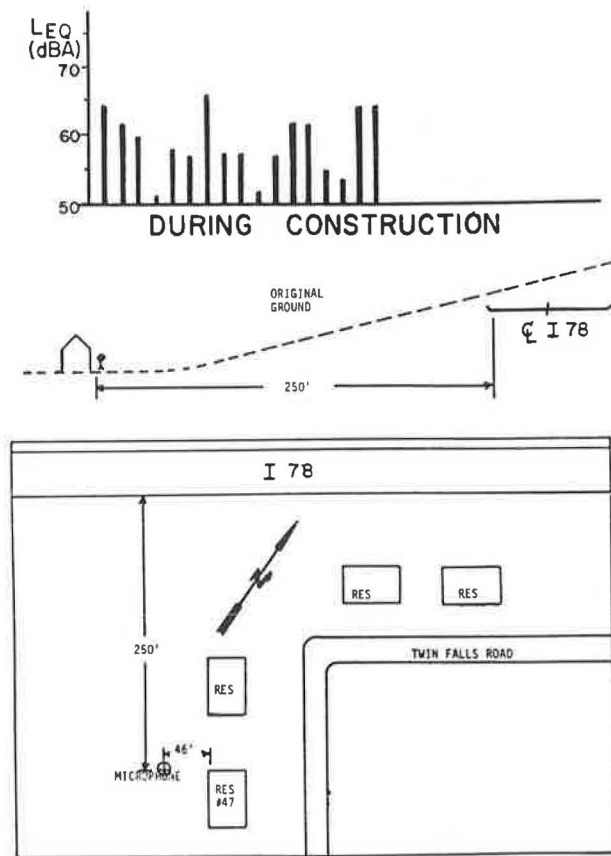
Site 9: Cowap home, 47 Twin Falls Road.
